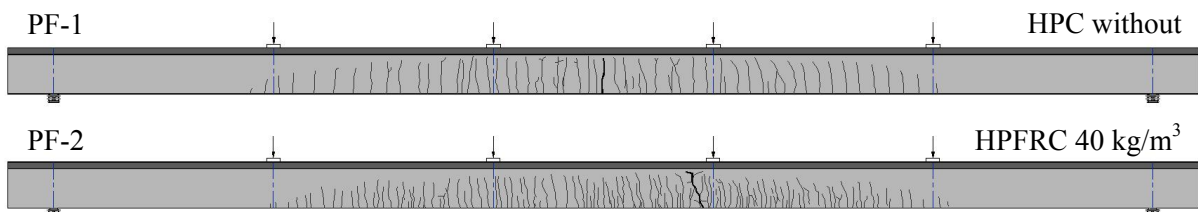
Cracking pattern of members PF-1 and PF-2
